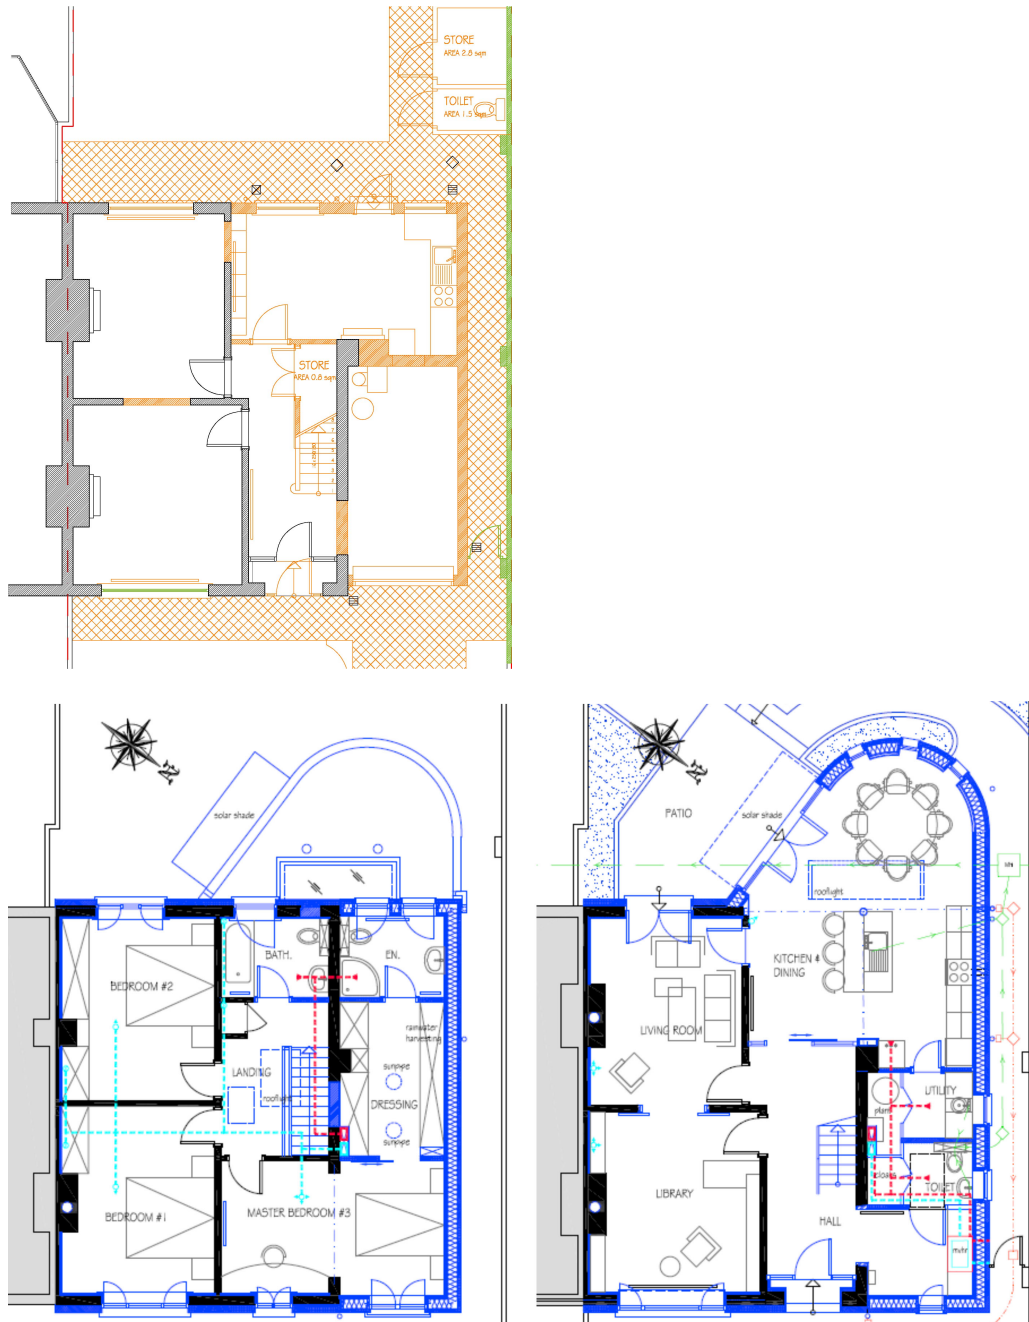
,3 & 4 existing ground floor plan showing demolished areas (orange) and proposed floor plan (blue)
